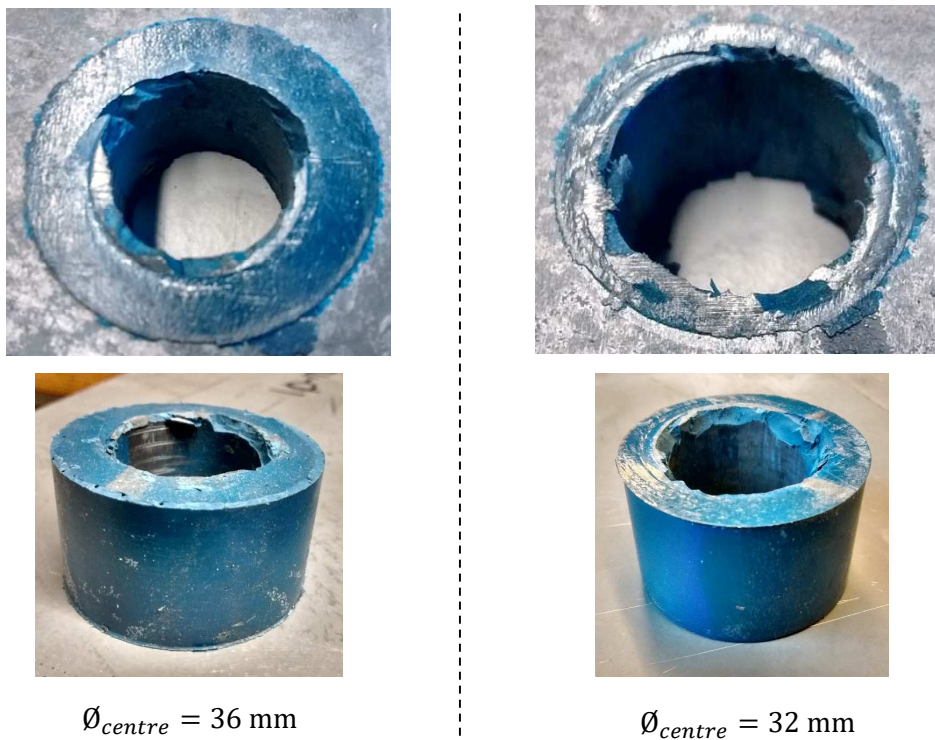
Top: centre plate bolt holes of resin-injected specimen after loading, bottom: resin infill after removal from centre plates by hand using a hammer
